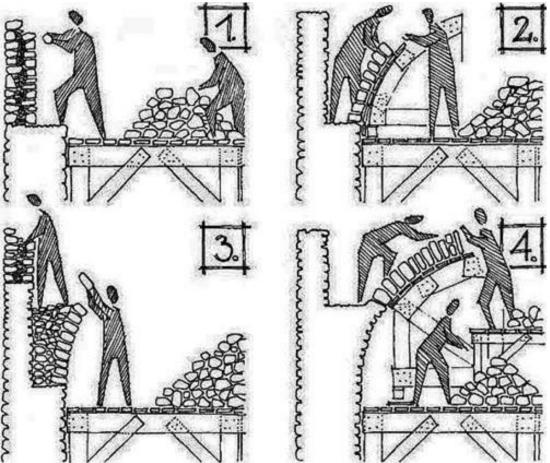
Shows:: Dome Construction Systems, Photos Collected (Anonymous)
